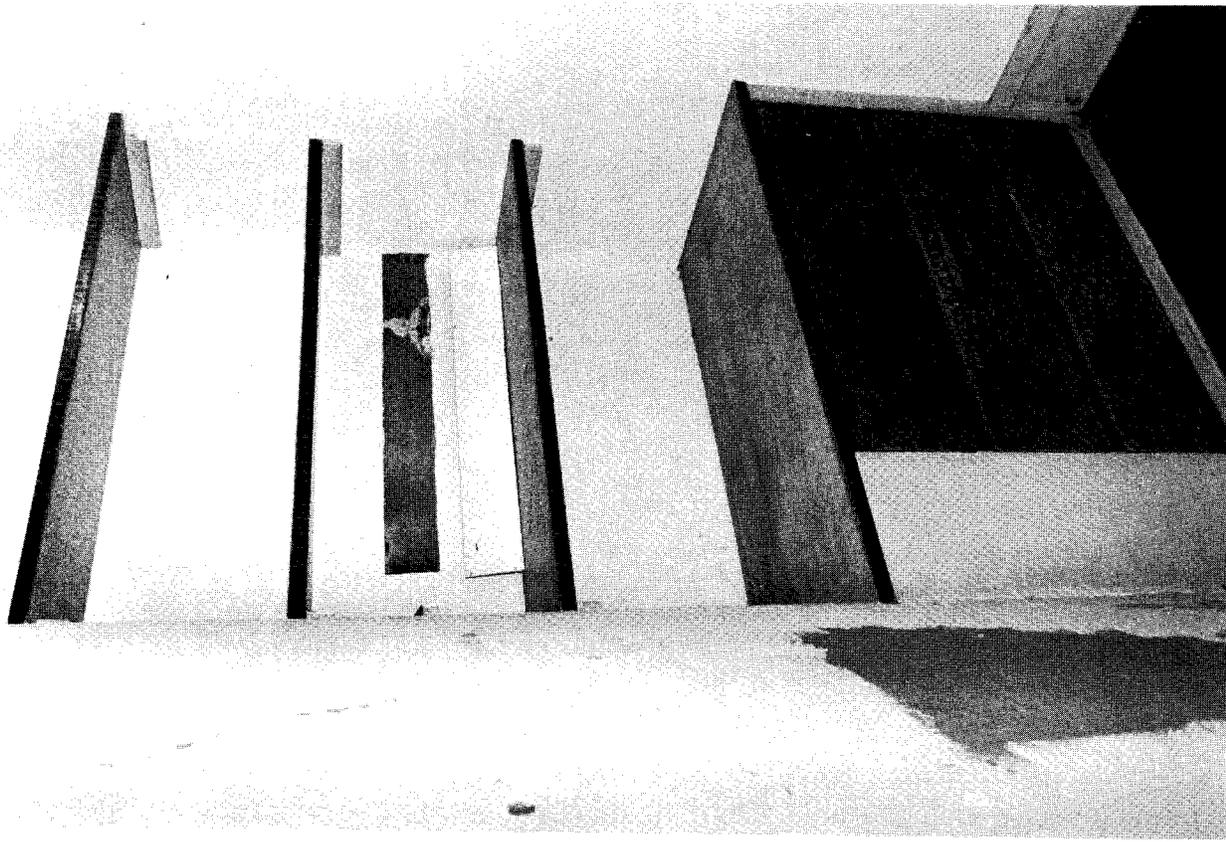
Penniman House: Pantry (Room 107), Drawers and Shelves in West-Wall Alcove (1984).
